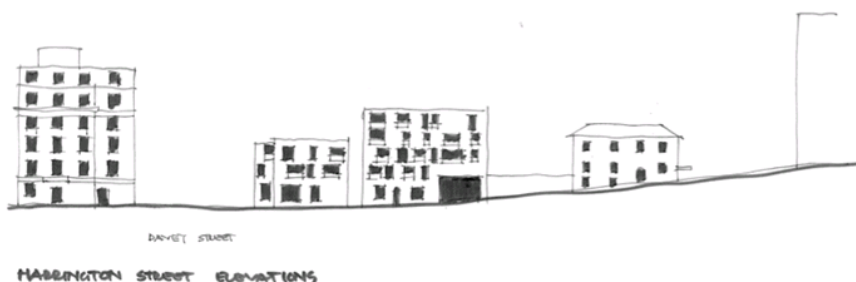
Harrington Street frontage. This sketch only shows the streetfront forms within the context of the nearby and adjoining developments. The design drawings show the taller elements of the building behind. The podium buildings are designed to fit within the scale of the precinct and the immediate setting.
